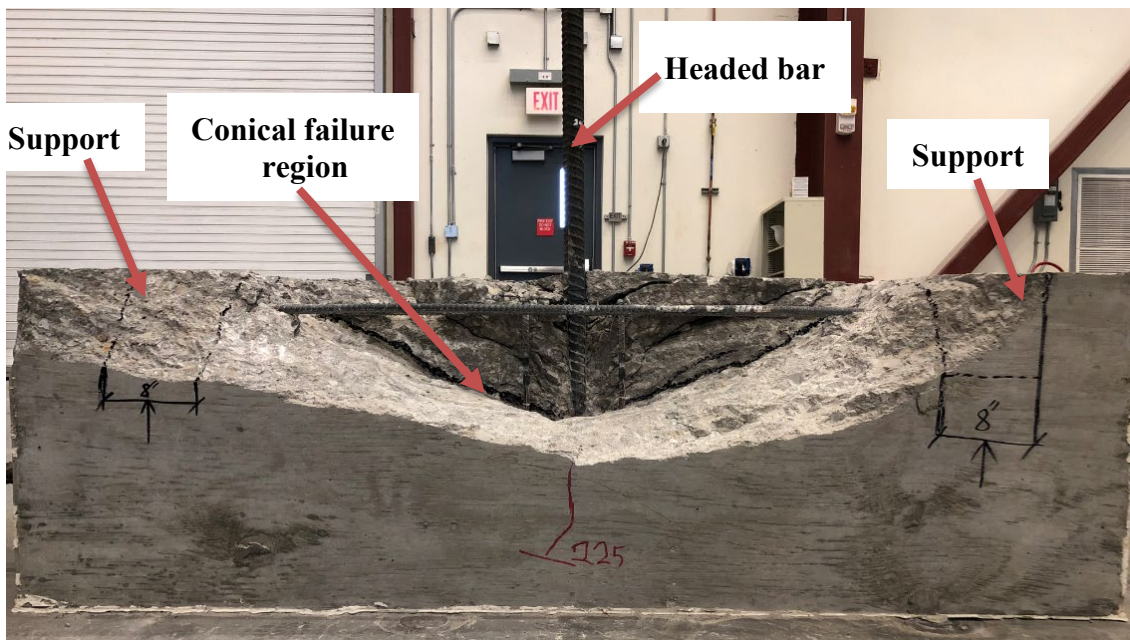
Concrete surface failure (crack propagation top and side views)
